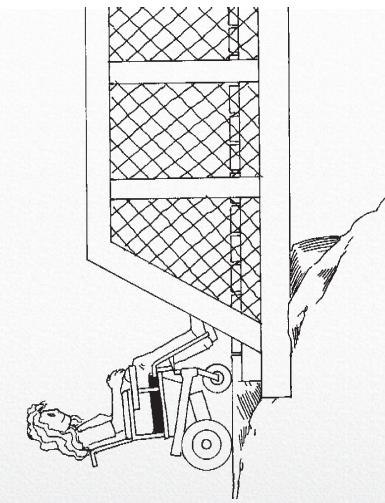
GOOD DESIGN: Bridges that are flush with the trail surface provide greater access to trail users.
